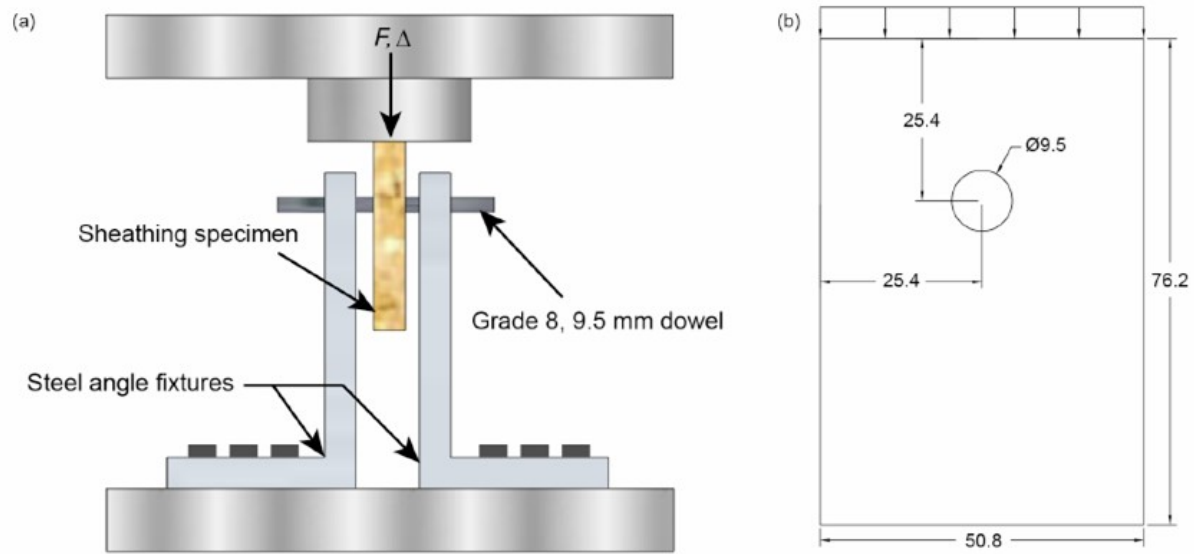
(a) Dowel Bearing Test Setup and (b) Sheathing Specimen Dimensions for Bearing Tests (Tao et al. 2016)
